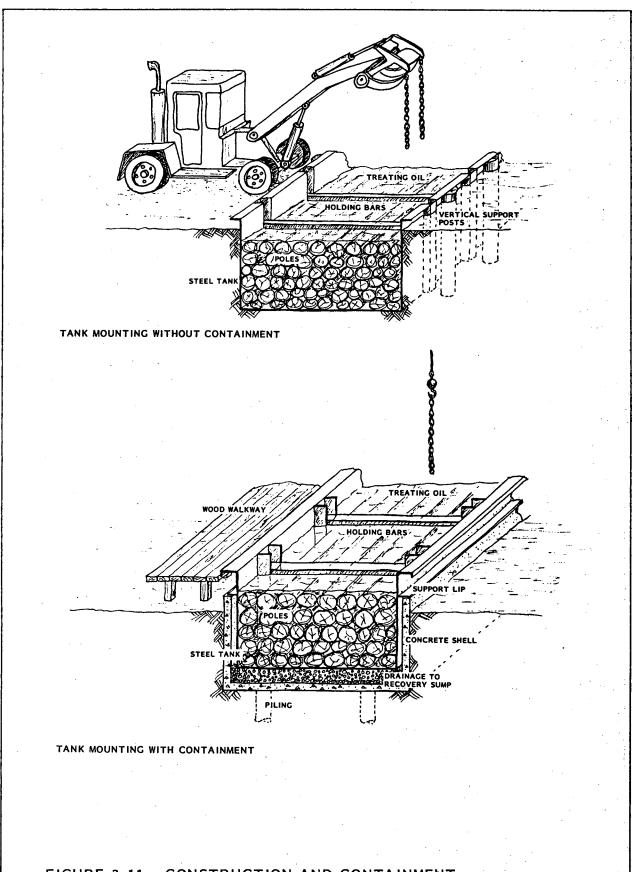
CONSTRUCTION AND CONTAINMENT
